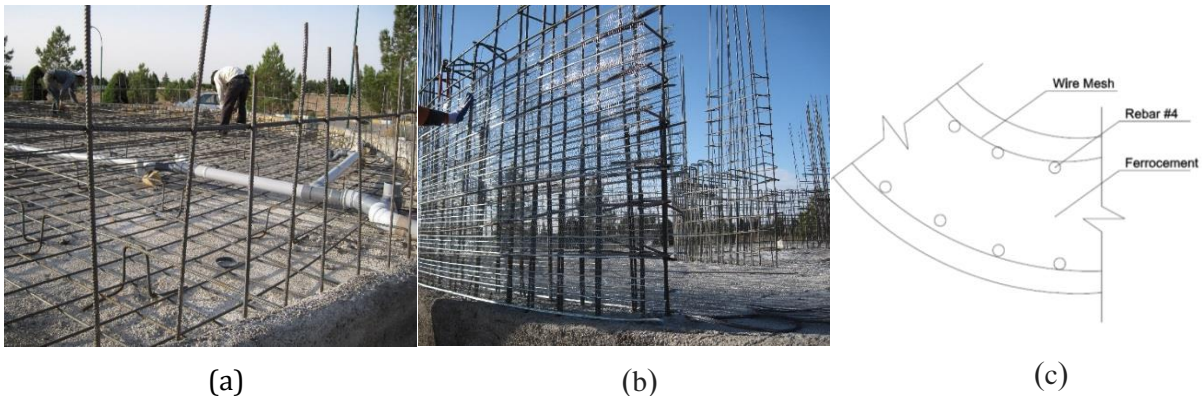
Experimental full-scale ferrocement building (a) skeleton rebar implement (b) fabricating wire mesh on thin wall (c) schematic detail of thin ferrocement wall
